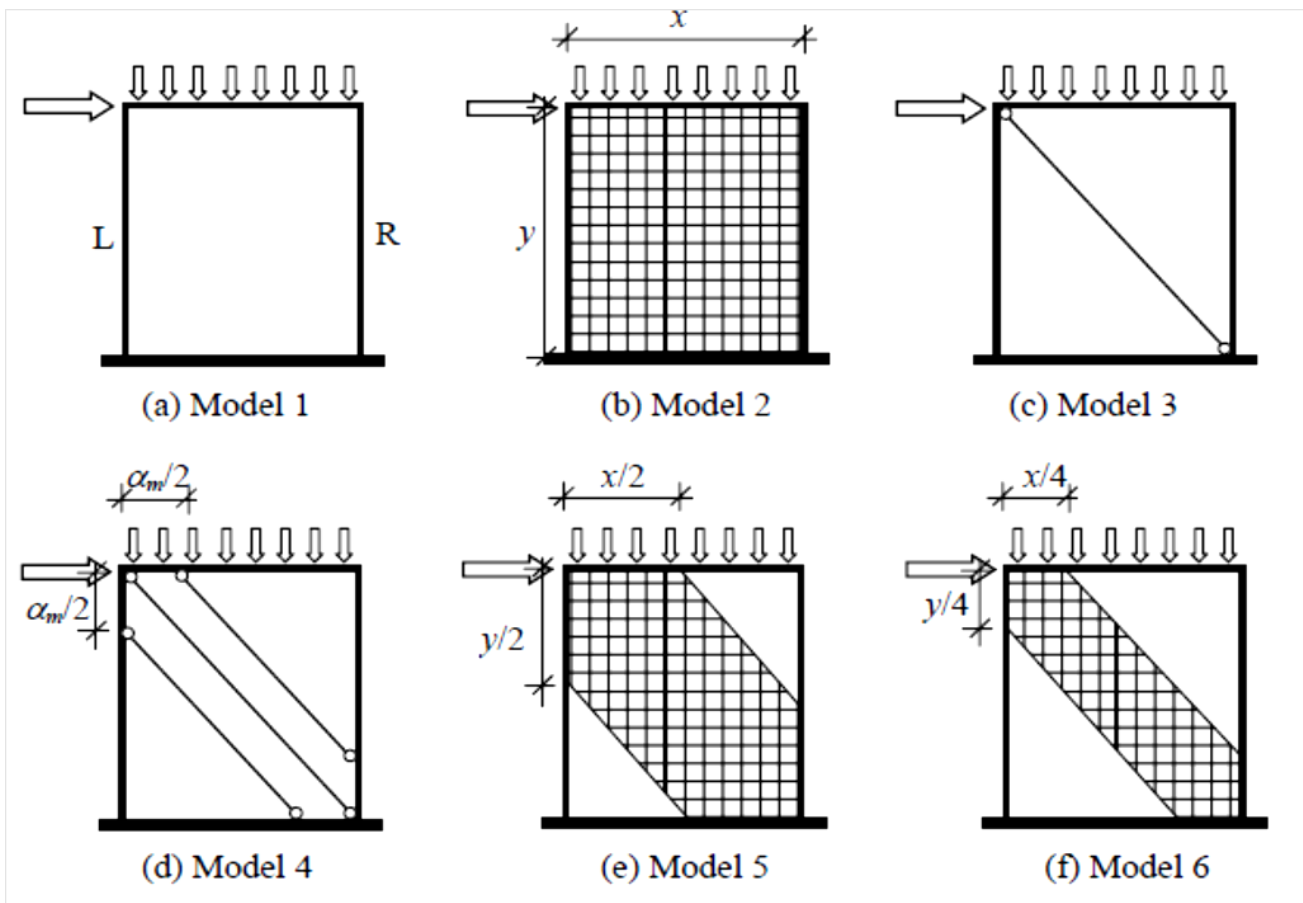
Different analytical models studied:(a) Model 1- bare frame, (b) Model 2-full infill wall modelled using finite element model,(c) Model 3-infill wall modeled using a single diagonal strut,(d) Model 4–infill wall modeled using three diagonal struts,(e) Model 5-partial infill wall modeled using finite elements such that only half of length of beam and column was in contact with the wall, and (f) Model 6-partial infill wall modeled using finite elements such that only quarter of length of beam and column was in contact with the wall, Jain, S.K et al (2008)
